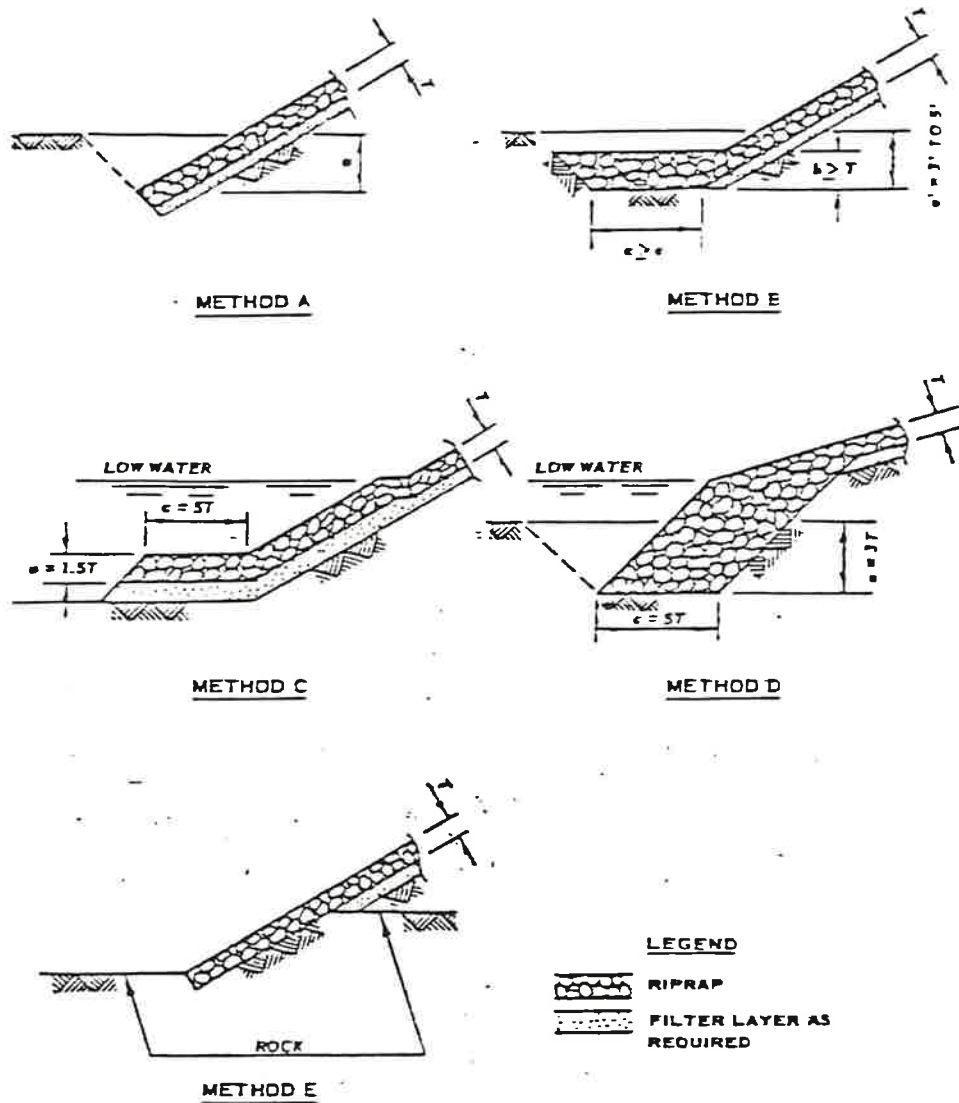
Methods of toe protection by trenching and thickened toe (U.S. Army Corps of Engineers, 1970).
